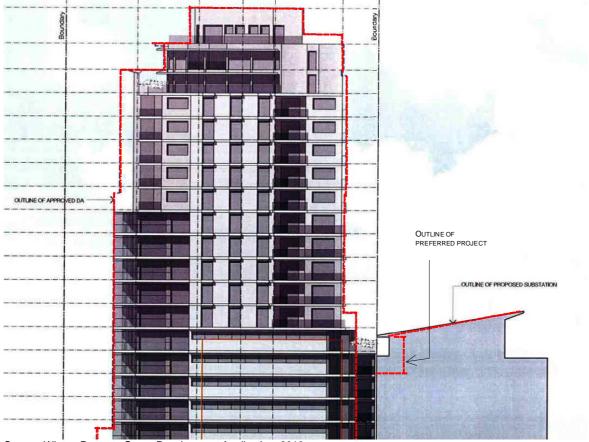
Proposed Winten and Castle Approved DA Building Profiles with Proposed Substation Profile
